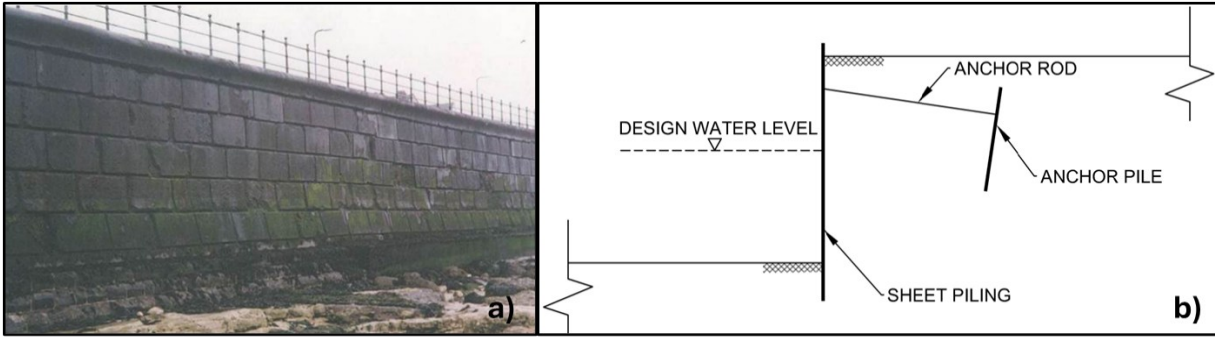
(a) Example of a vertical seawall (EurOtop 2018), (b) Cross section of a typical bulkhead (adapted from USACE 2002)
